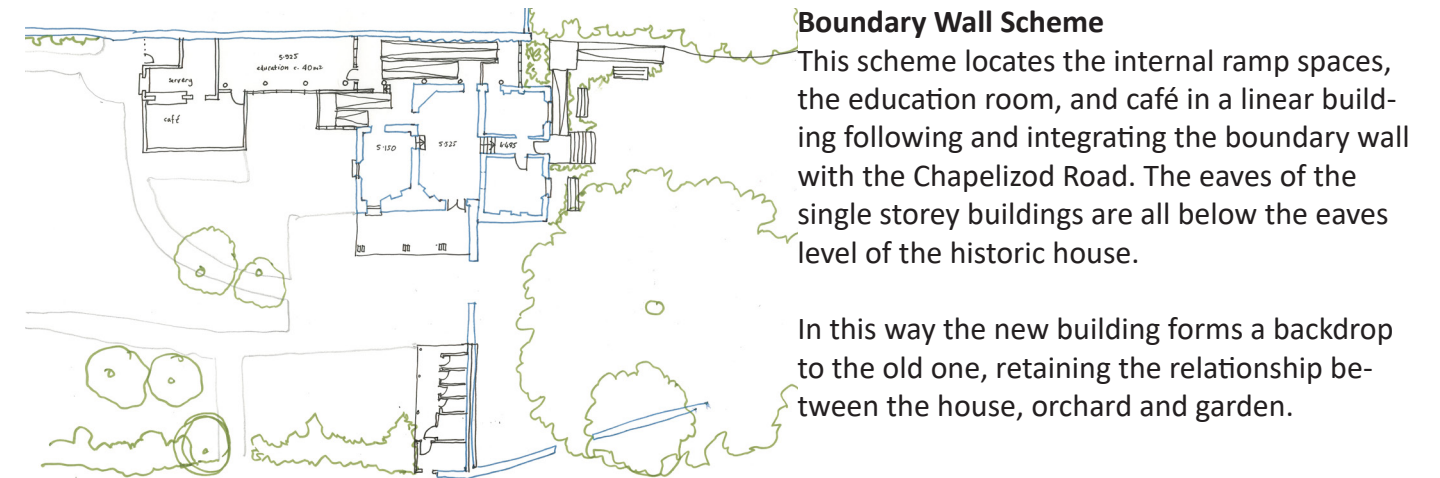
Plan of the "Boundary Wall" scheme.
